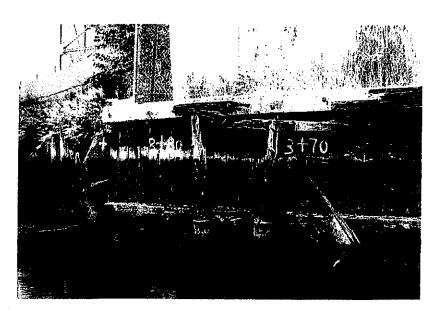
STA. 3+80 SOUTH END OF TIMBER BULKHEAD
